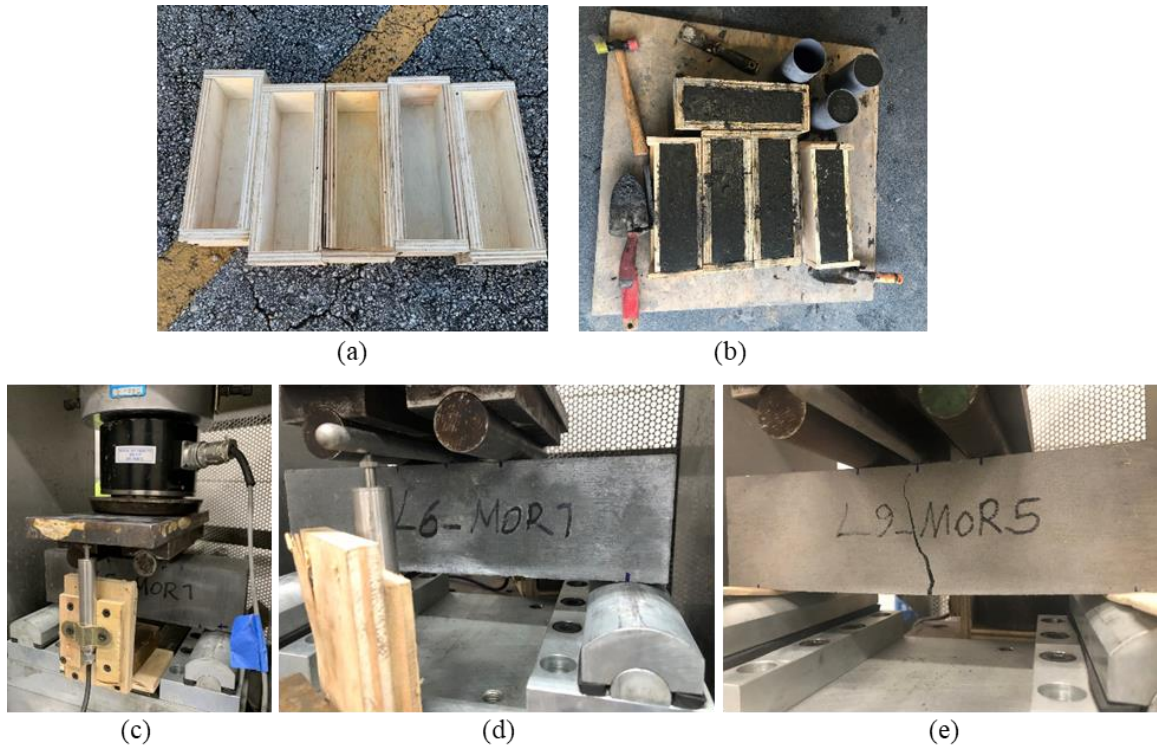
Modulus of rupture test; (a) wooden formworks, (b) filled specimens with fresh UHPC, (c) test setup, (d) LSC sensor reads the mid-span deflection, and (e) typical flexural failure of beams
